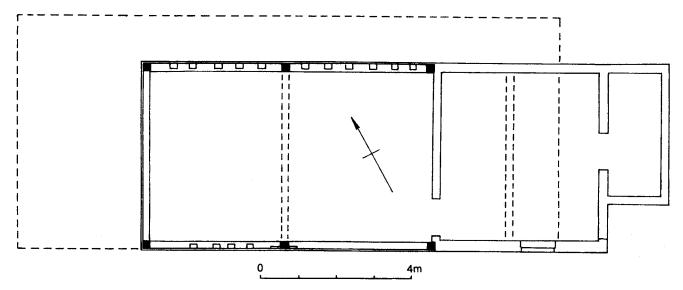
Plan of outbuilding at Bocking Hall. The probable ground plan as originally built in indicated with a single dashed line
